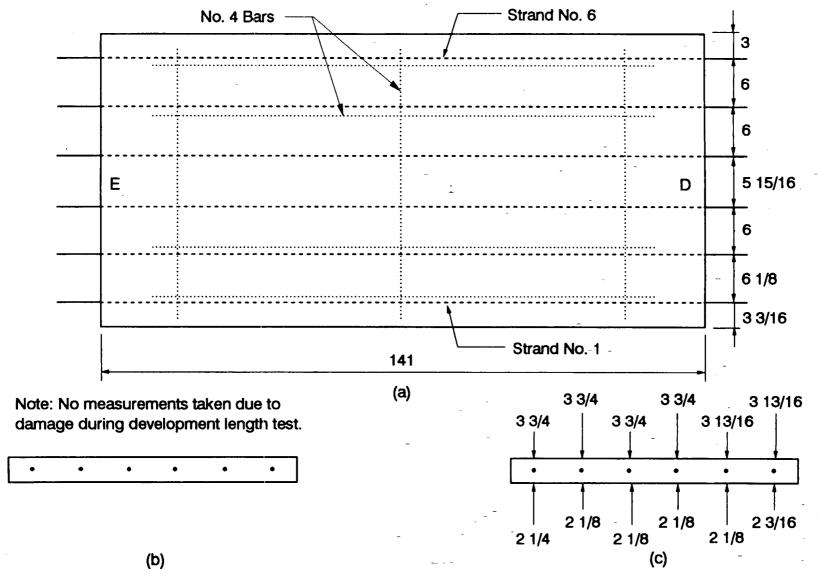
Specimen No. 9-6.0DC-3 (dimensions shown in inches):
